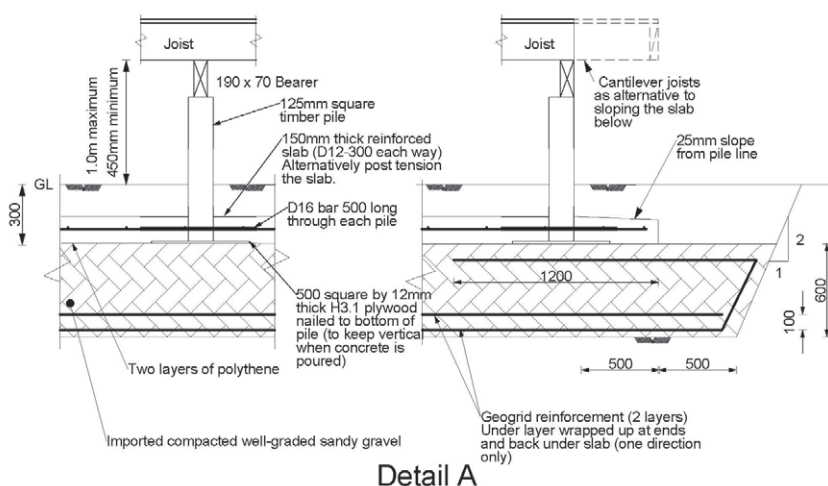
Section through Type 2B surface structure at the timber piles (including gravel raft)
